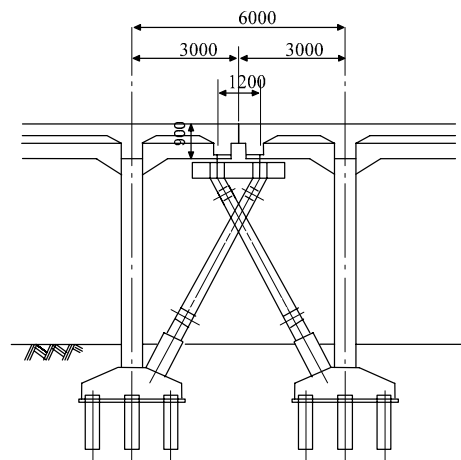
Outline of X-strut reinforcement¹⁰⁾
